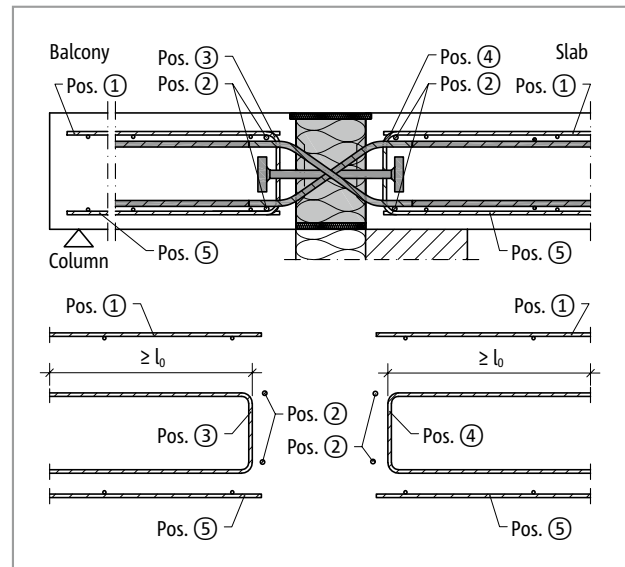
Schöck Isokorb® XT type Q-P-VV: On-site reinforcement
